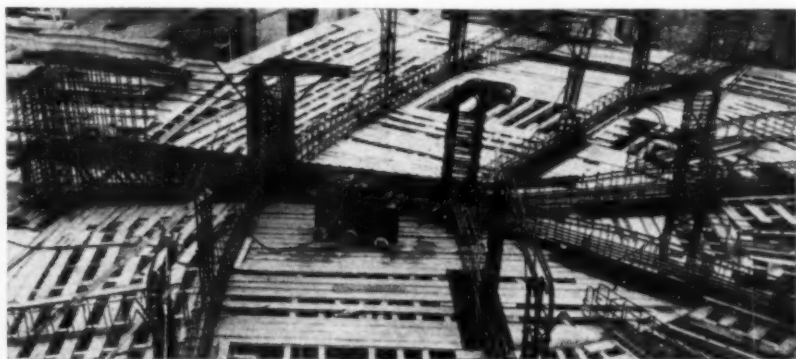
Lower Chords of Vierendeel Girders : Mild Steel Reinforcement and Prestressing Cables in Position.
